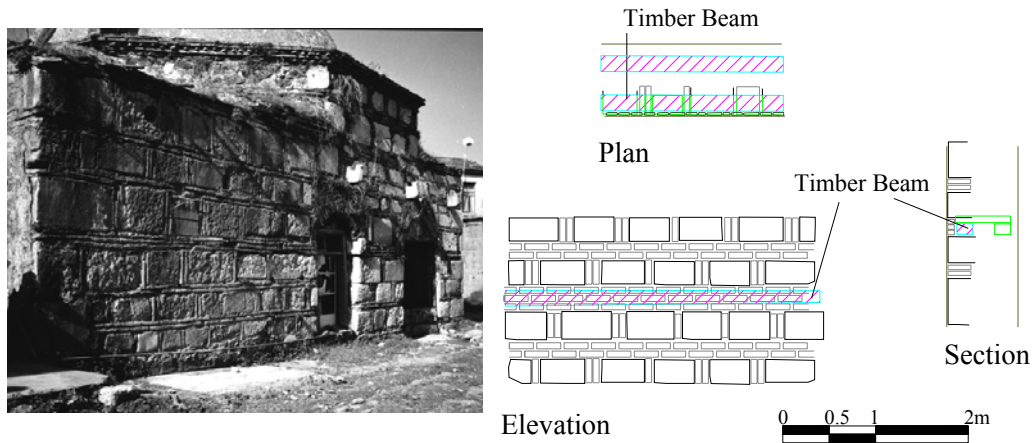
Seferihisar Büyük Hamam, East elevation, Cut stone-brick alternating bond
